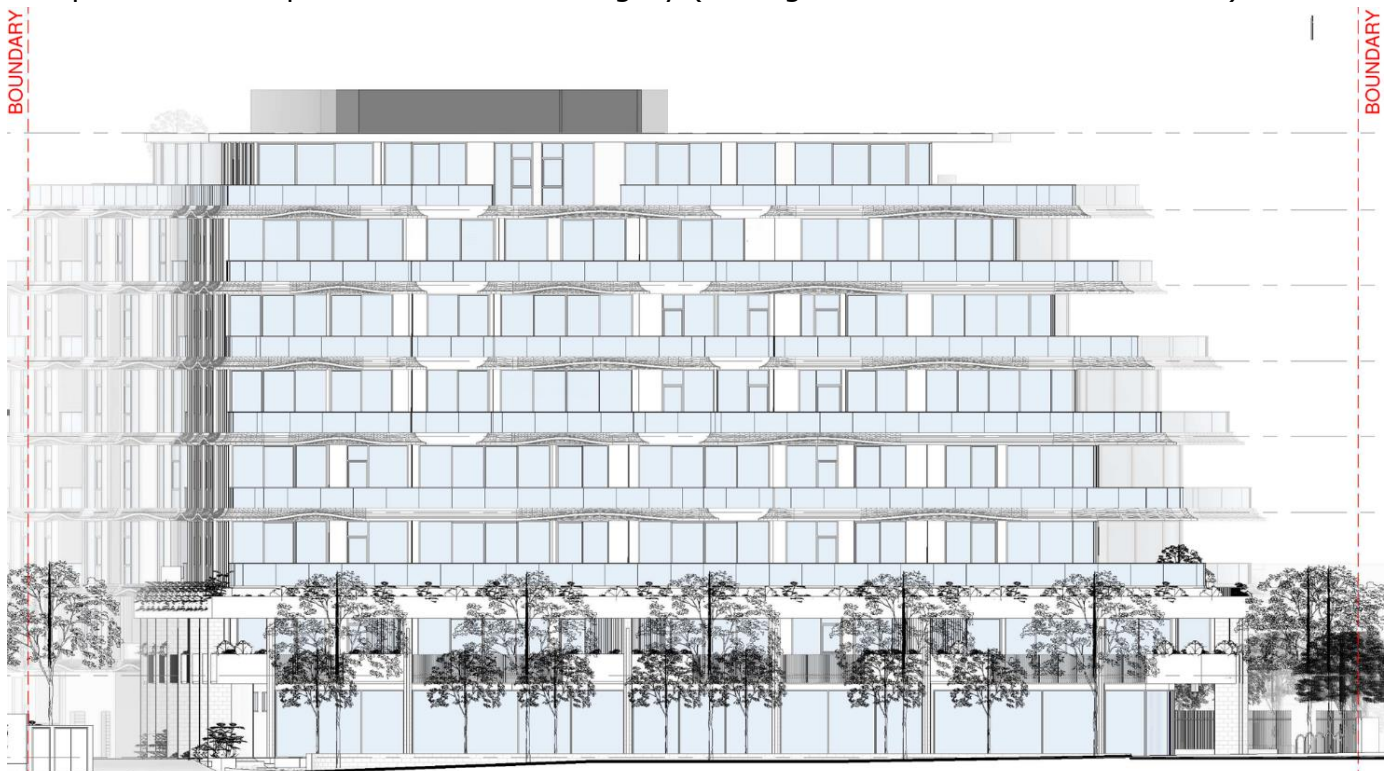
Approved Street Elevation and Feature Banding Design and Form
